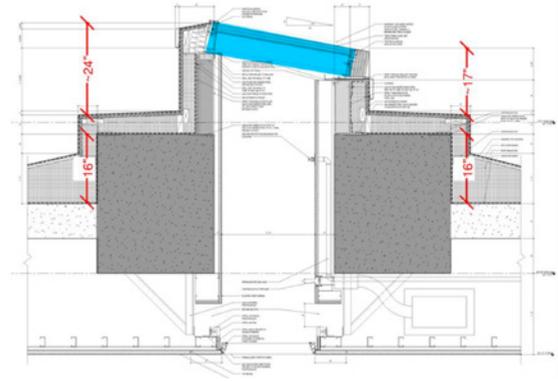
Section through P.T. beams. (Source: Murphy et al., 2016.)
